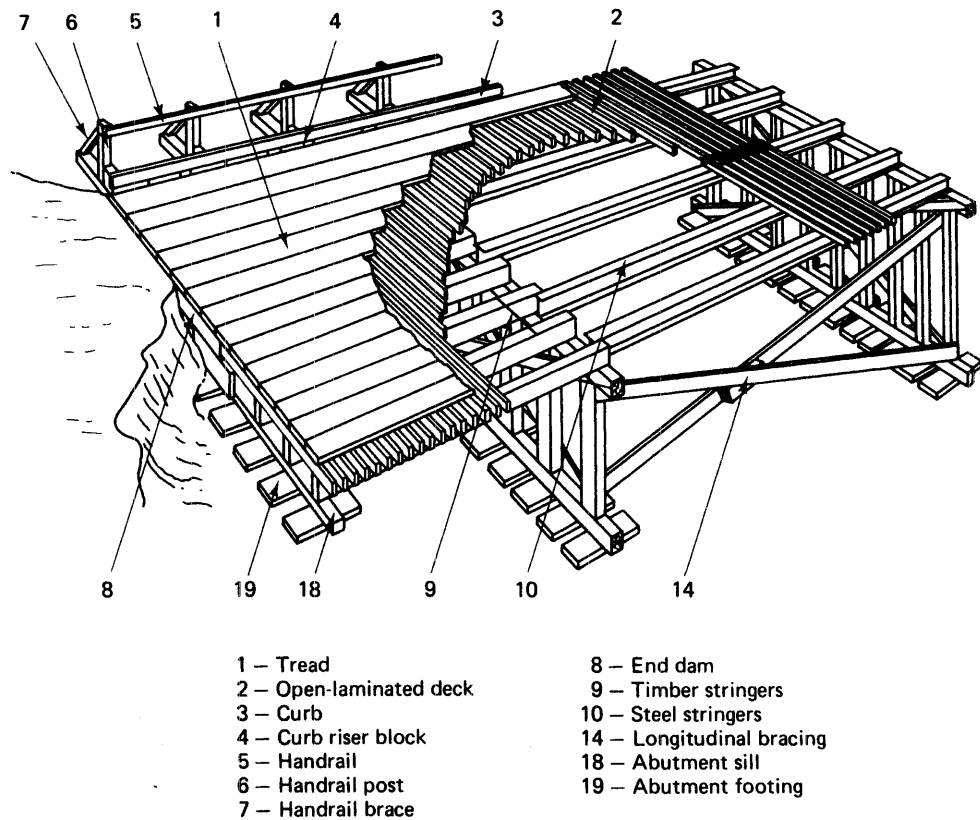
Timber trestle bridge with frame bent. (U.S. Department of the Army)
